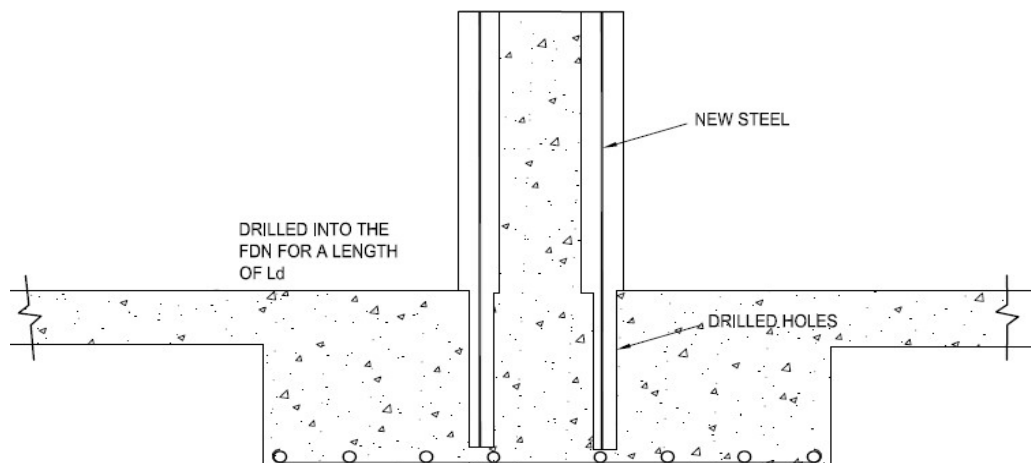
Anchoring of extra steel by drilling holes in the foundation for a length of development length in tension.
